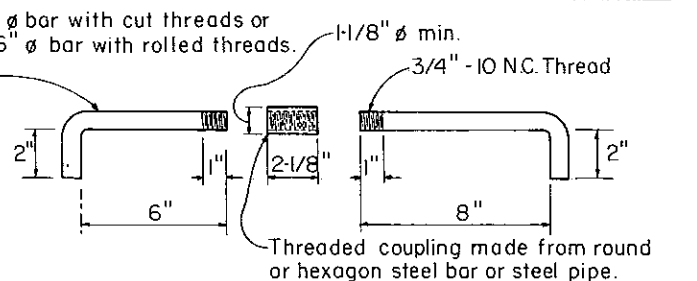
DETAIL OF HOOKED BAR WITH 5/8" THREAD
